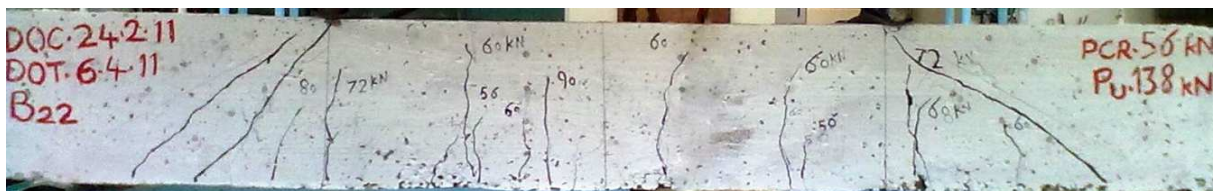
Crack Pattern of Fly ash Concrete Beam
